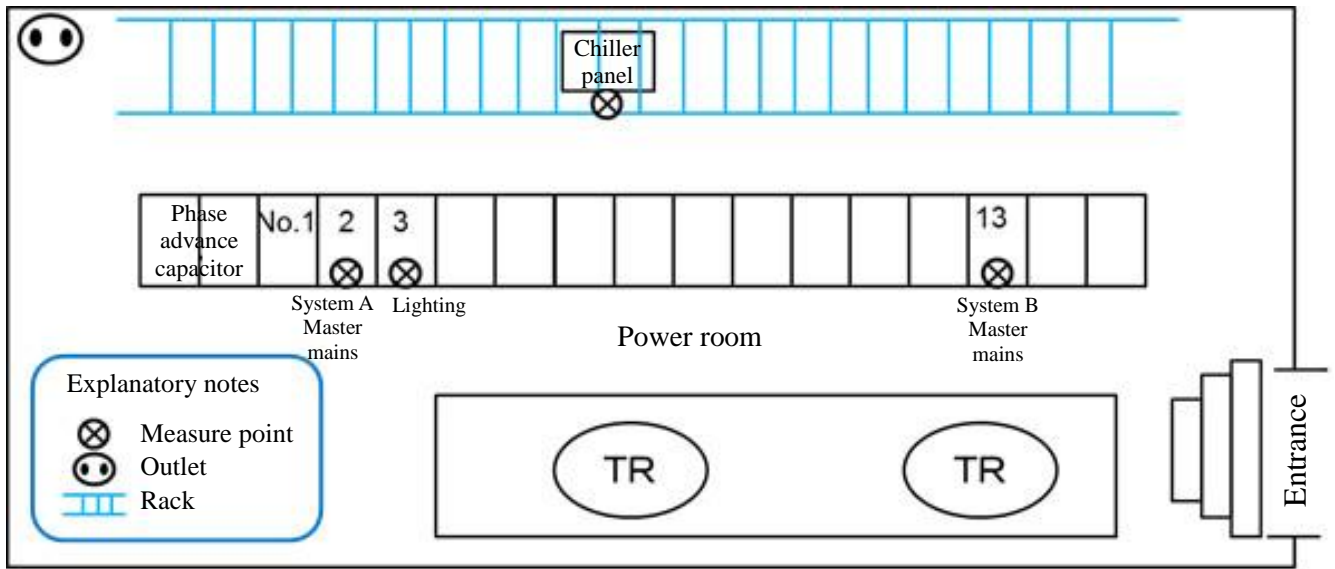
Plan view of the power room (on the 1st basement floor)
